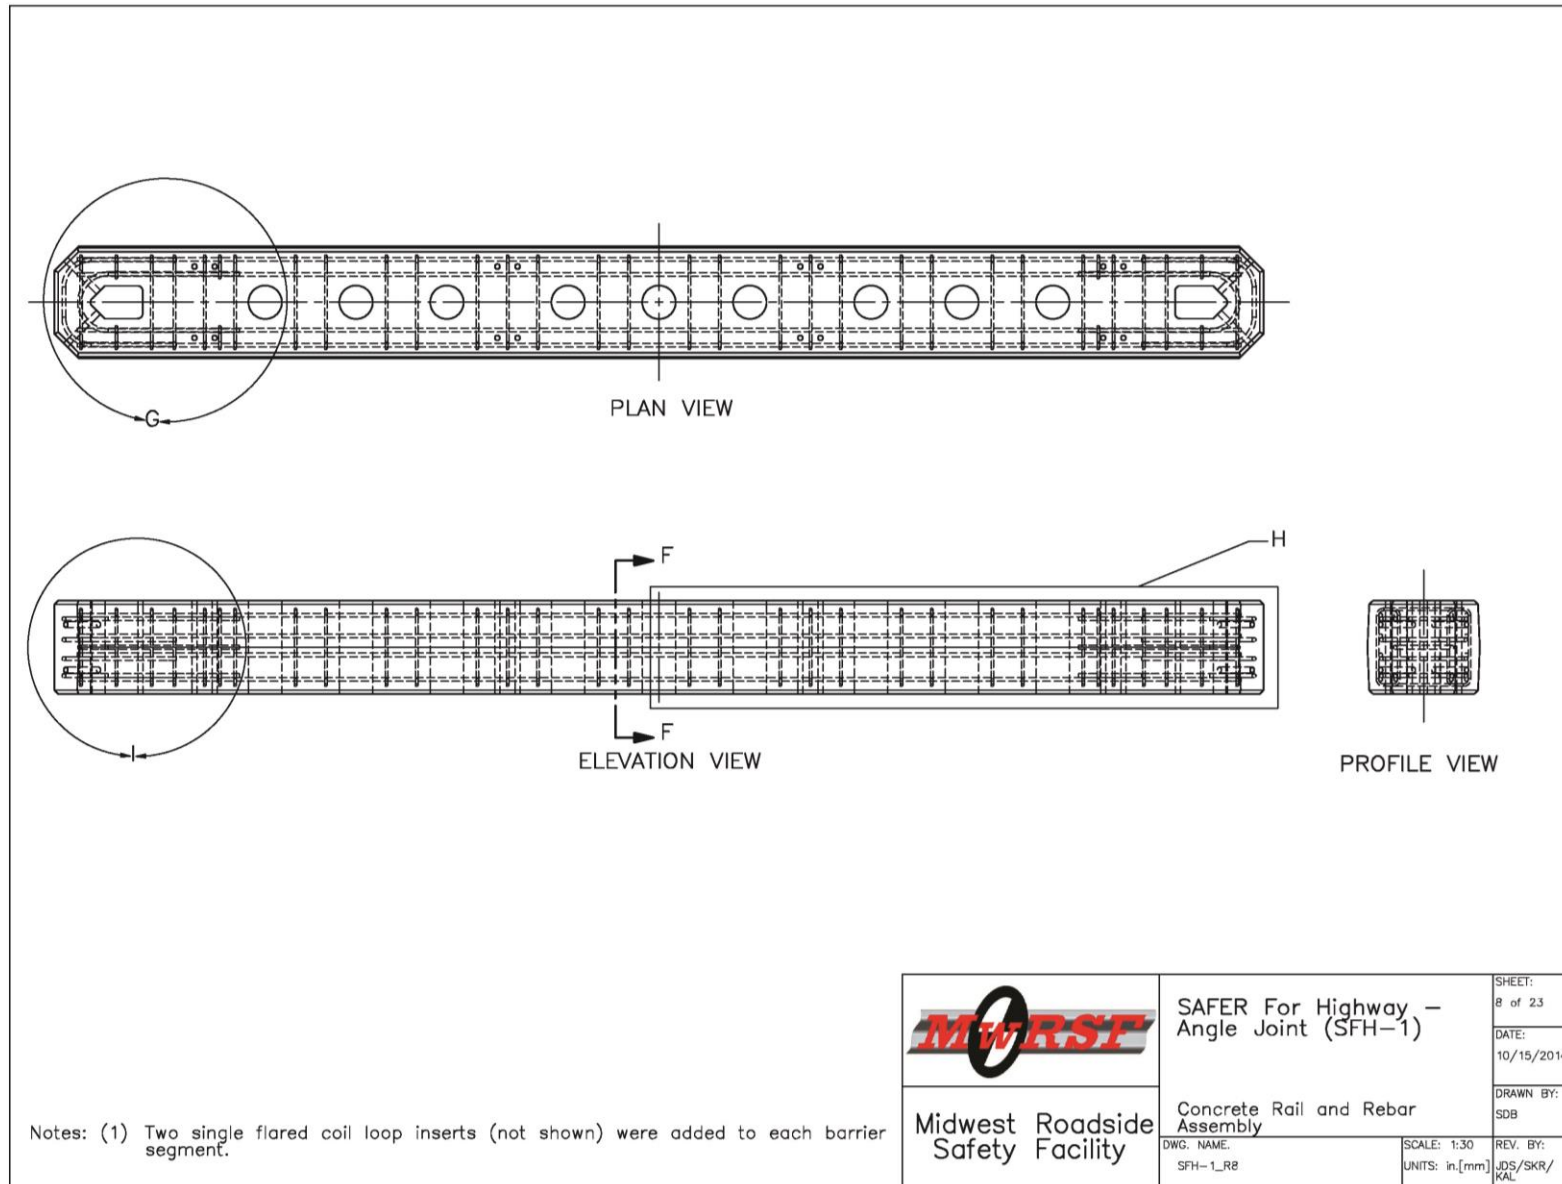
Recommended Barrier Design for Full-Scale Crash Testing, Concrete Rail Details
